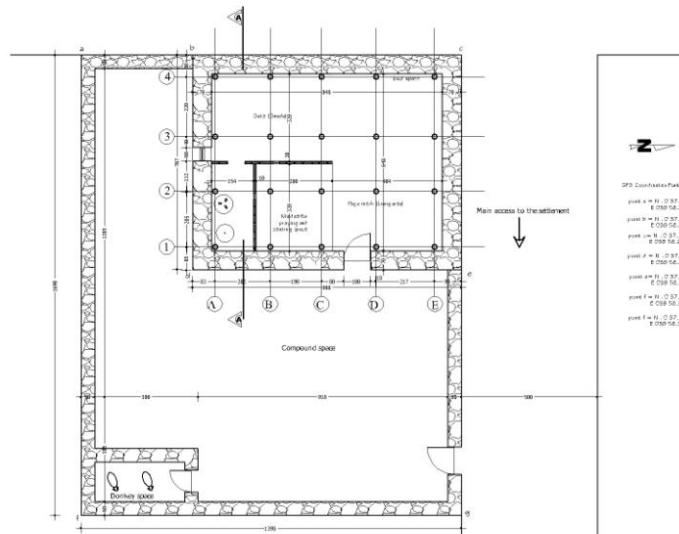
3 Compound and floor plan of Ato Endris Kemal Nur's house.
